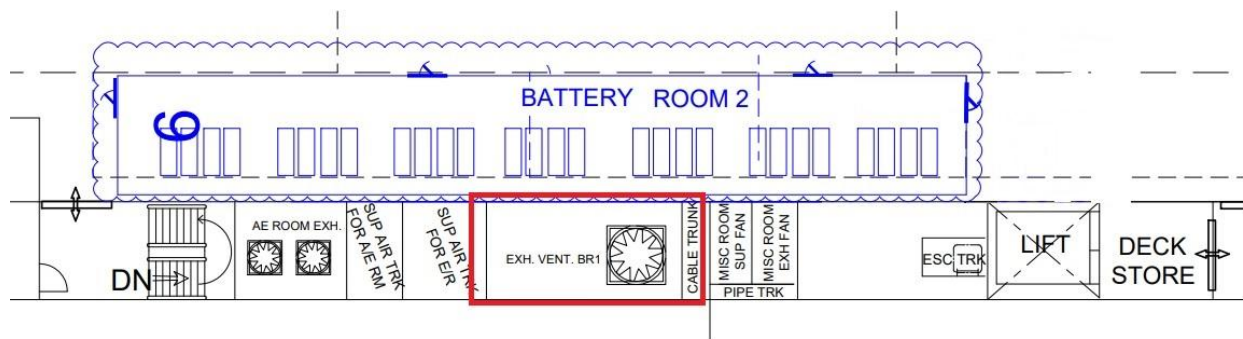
Proposed locations of Exhaust Ventilation System of Battery Room No.2
